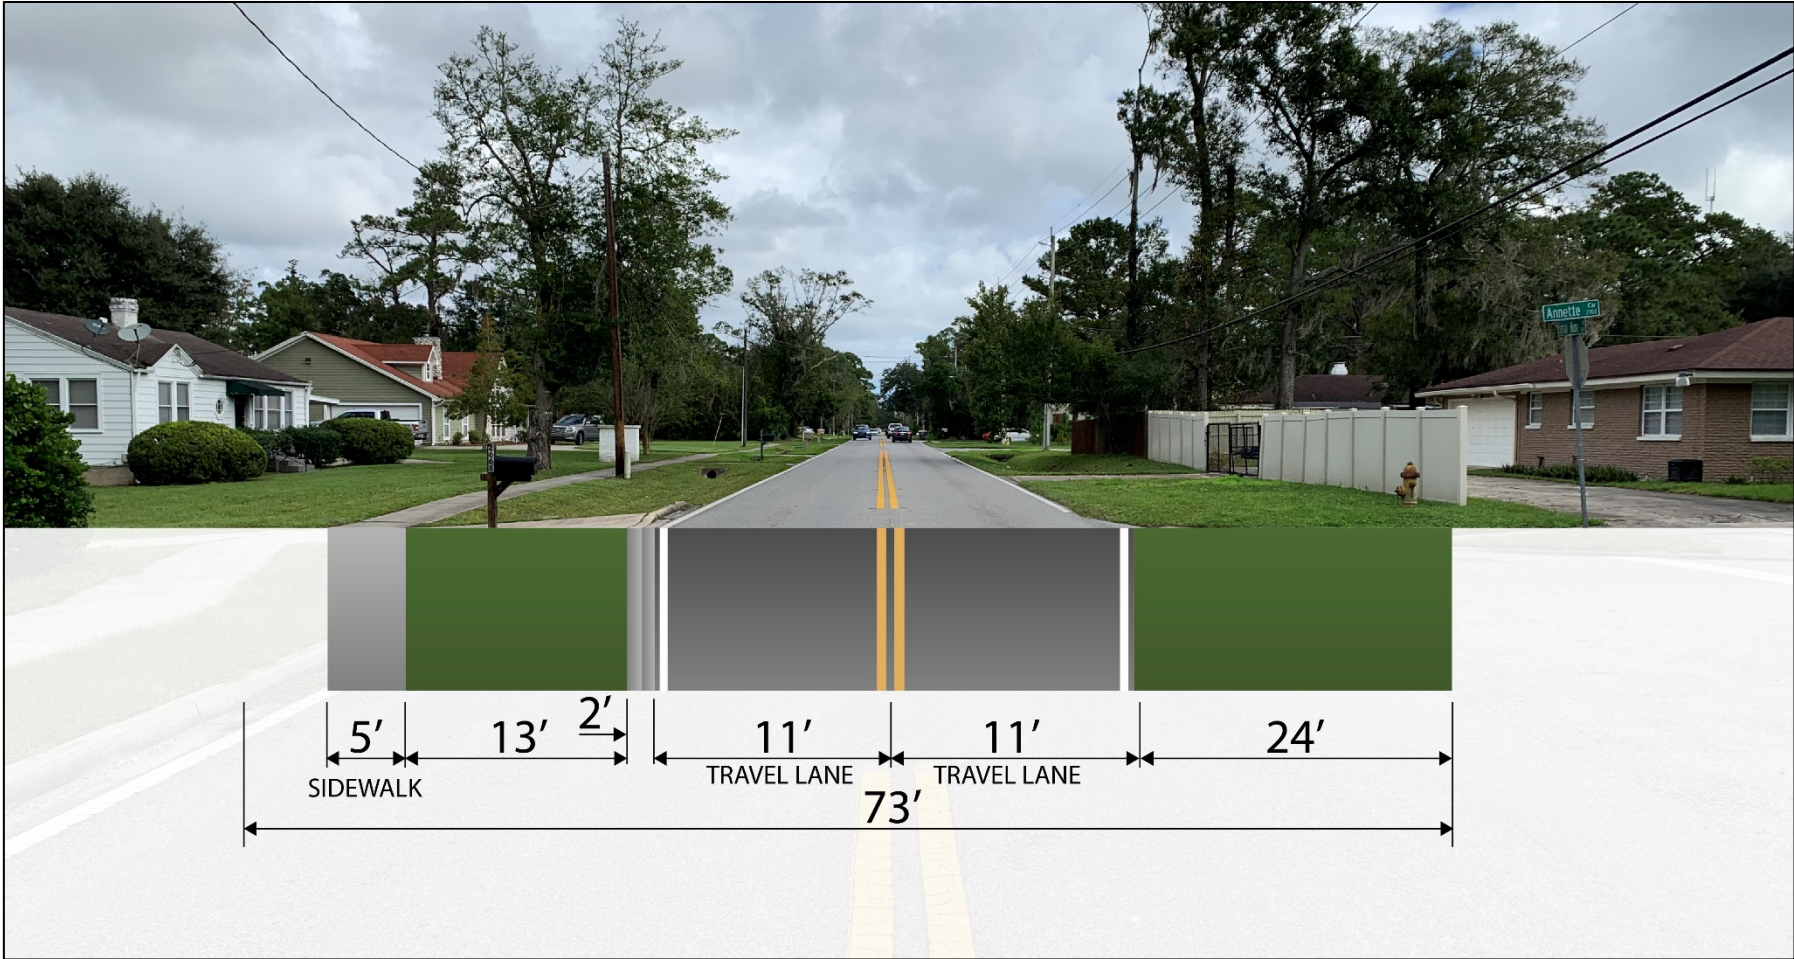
TYPICAL SECTION: SOUTH OF DEAN ROAD
